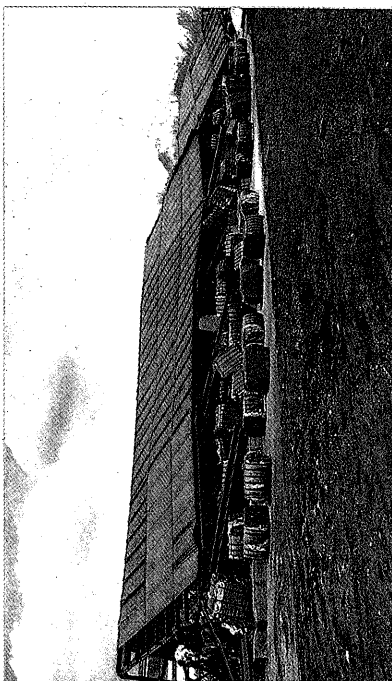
Westwards Failure of Steel Storage Shed at the Sumerbank Textile Factory
